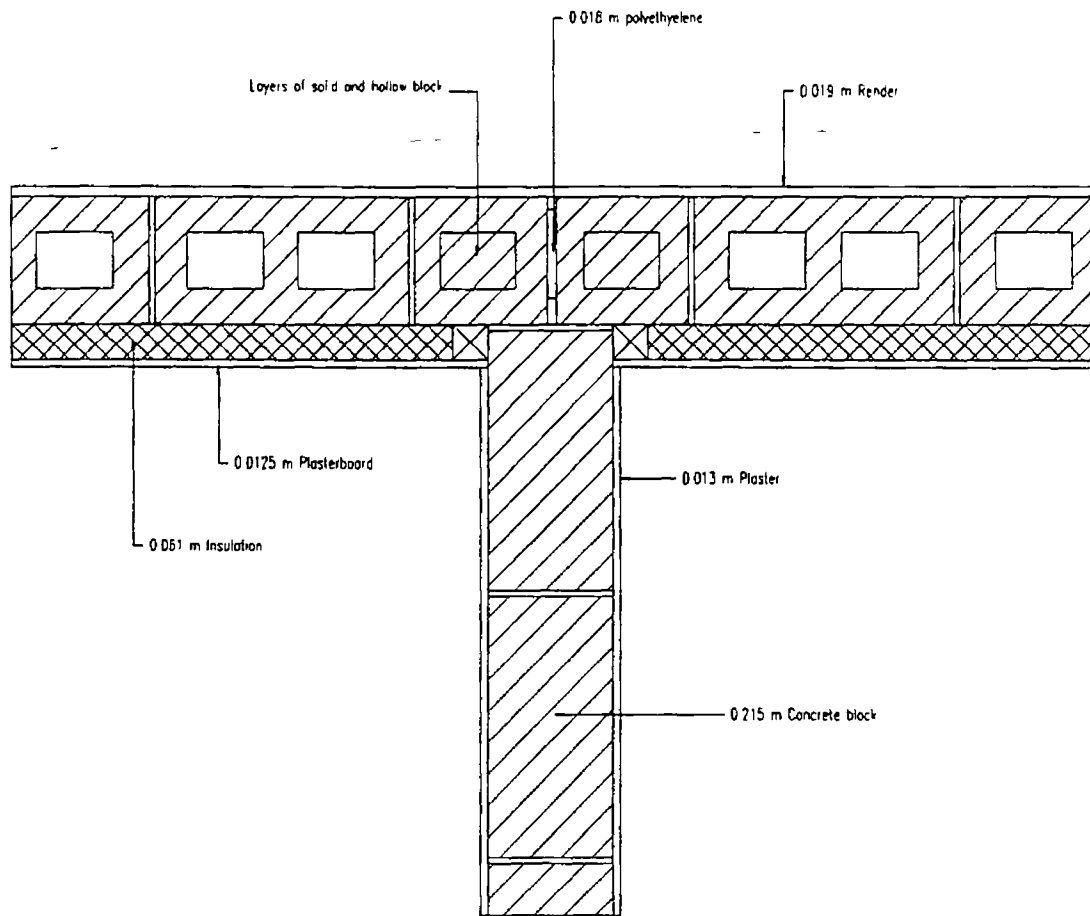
11 1. Party Wall of Two Adjoining Semi-Detached Houses
